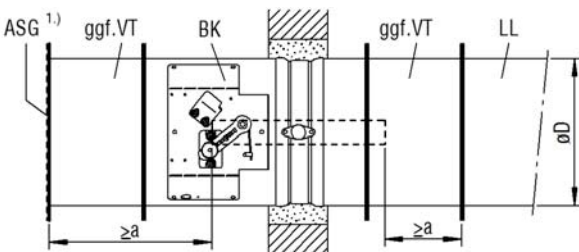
Connection example of a ventilation duct arranged on one side and security grille
